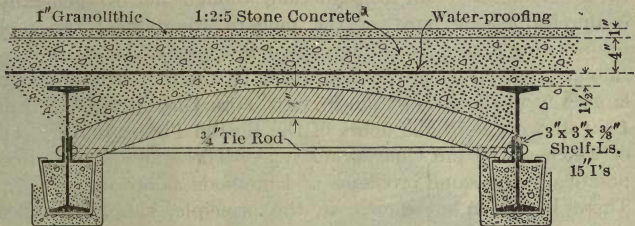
Brick Arch Construction in Post Office Building, Los Angeles, Cal.
